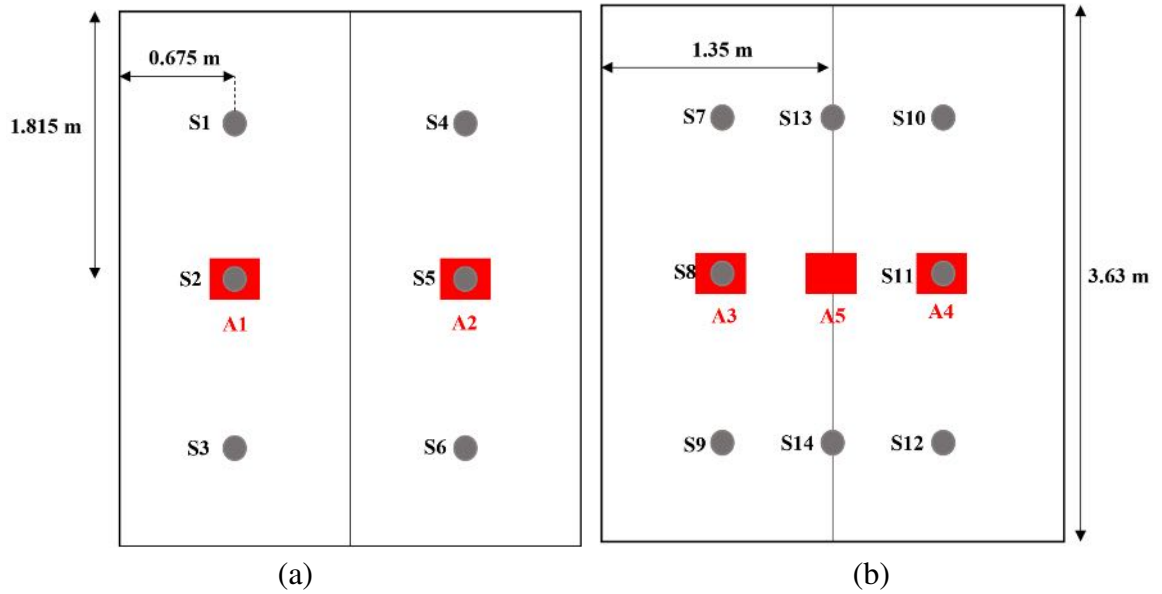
The layout of accelerometers (A) and strain gauges (S) on the double-glazed glass unit (a) External wall (b) Internal wall
